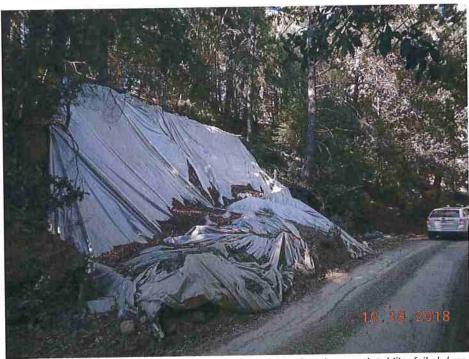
RP12. Facing north. Repair slide, pull material out of road way and stabilize failed slope.
